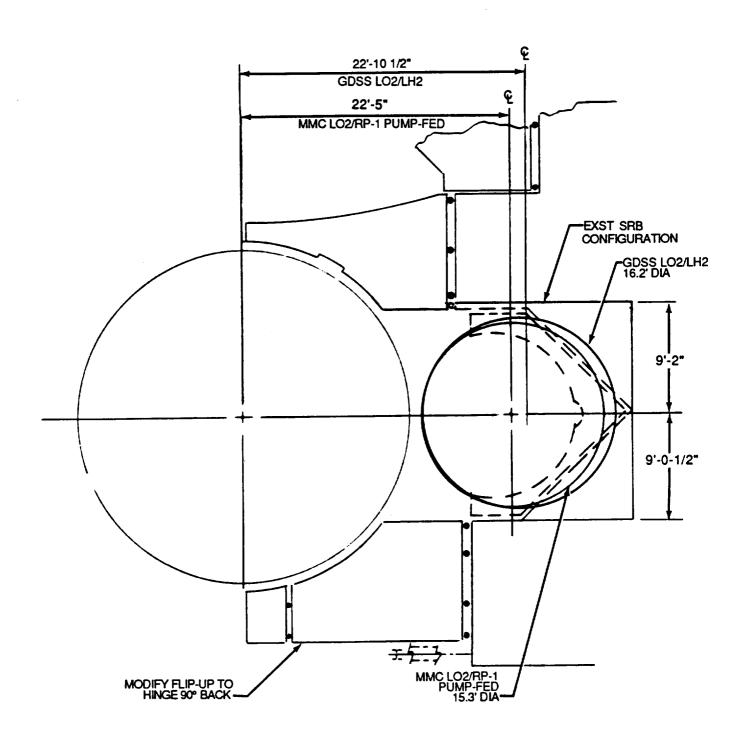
Roof - Ext. Work Platform 'D' Interferences.
